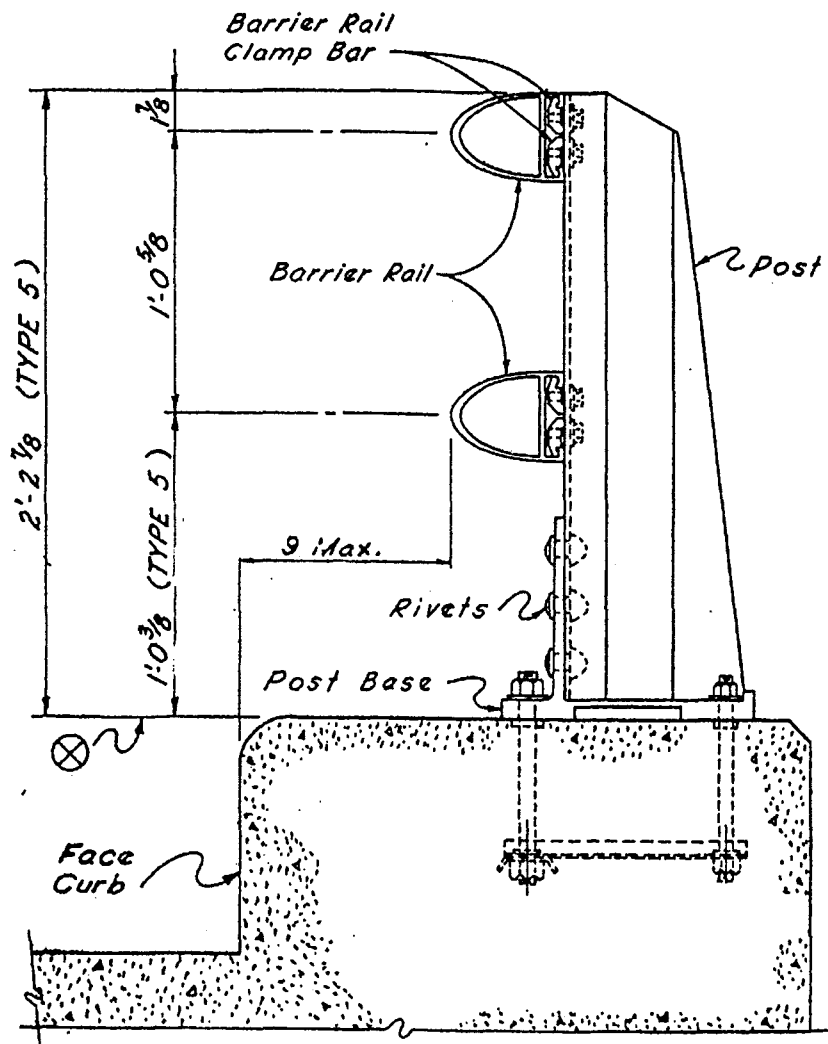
Type 5 Aluminum Bridge Railing Cross-Section
